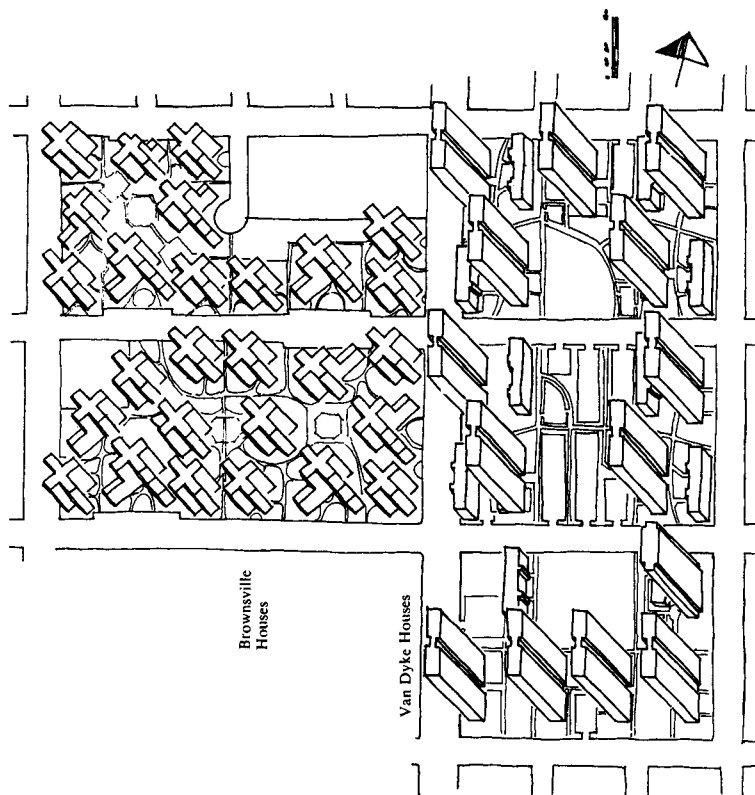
Site plan of Brownsville and Van Dyke Houses
